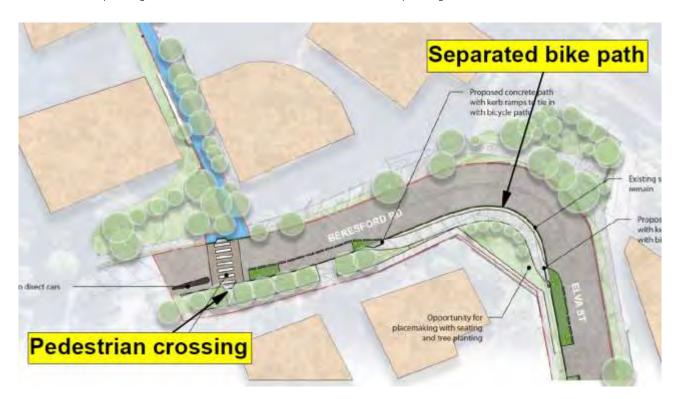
Section 3 Part V of the HMaPP between Beresford Road and Elva Street
